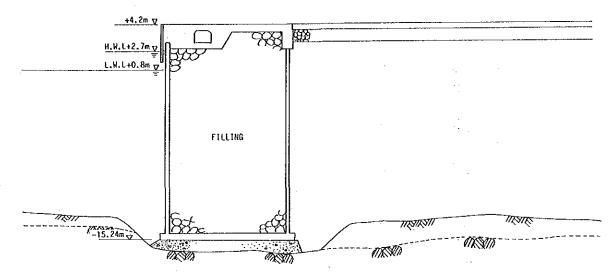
(1) Existing Quay Wall (Berth No.1A)
